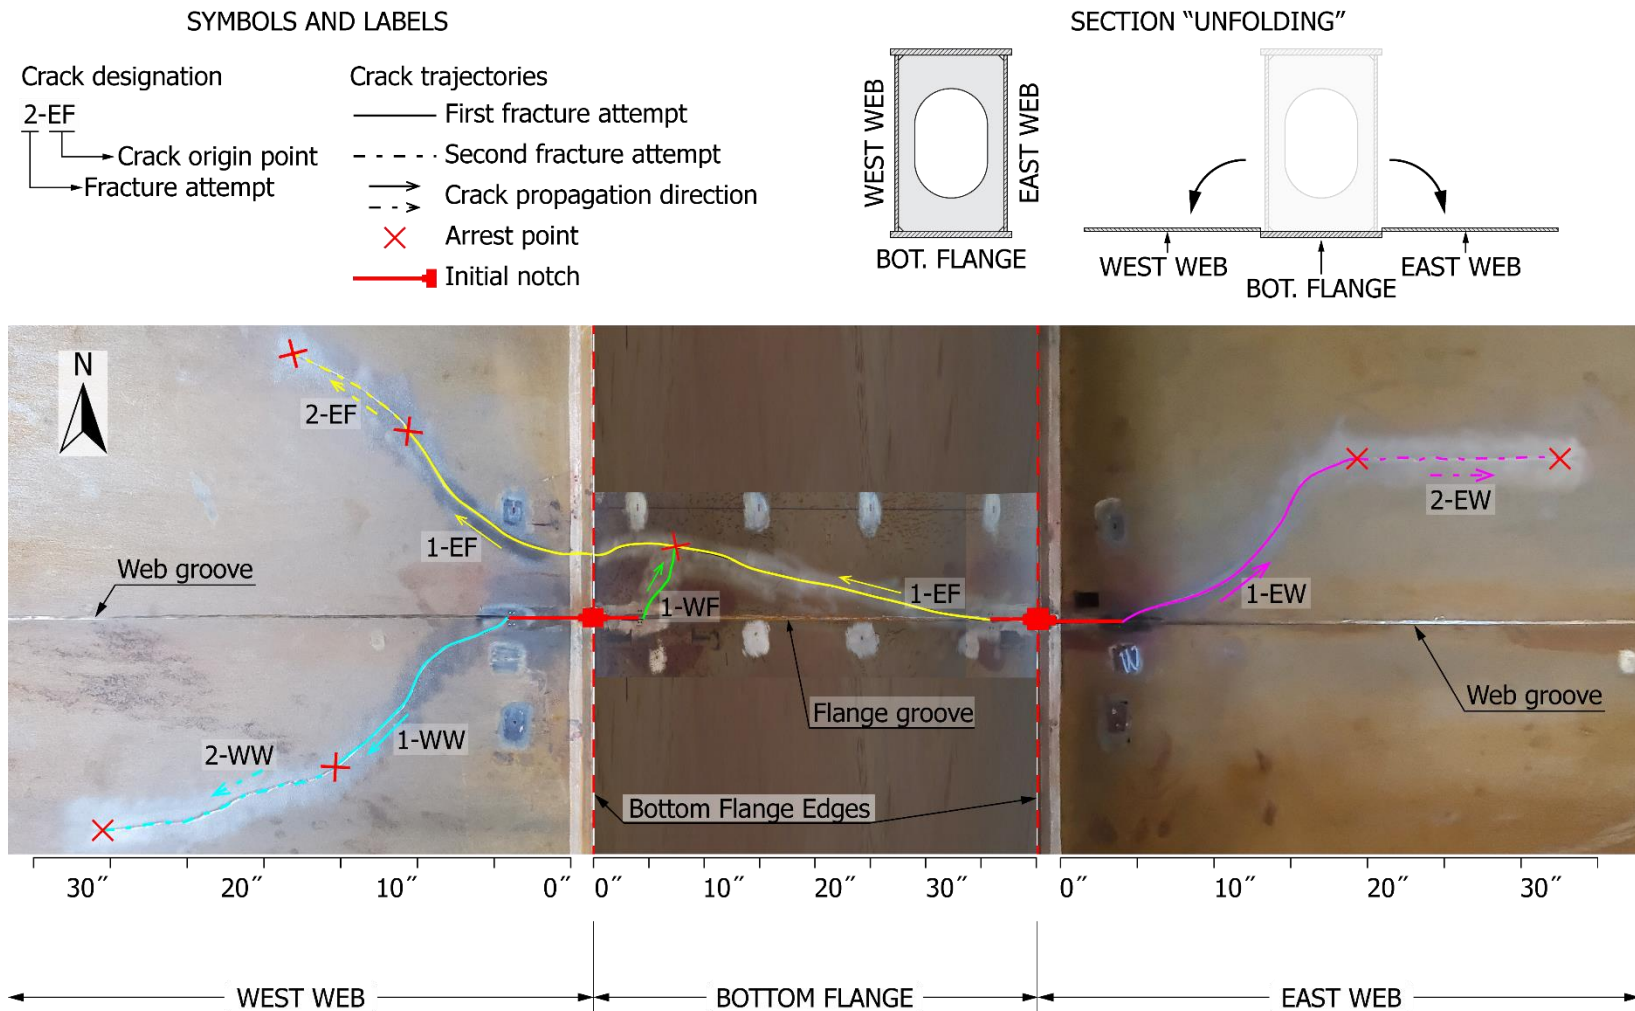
Baseline Specimen: cracks after completion of Fracture Test
